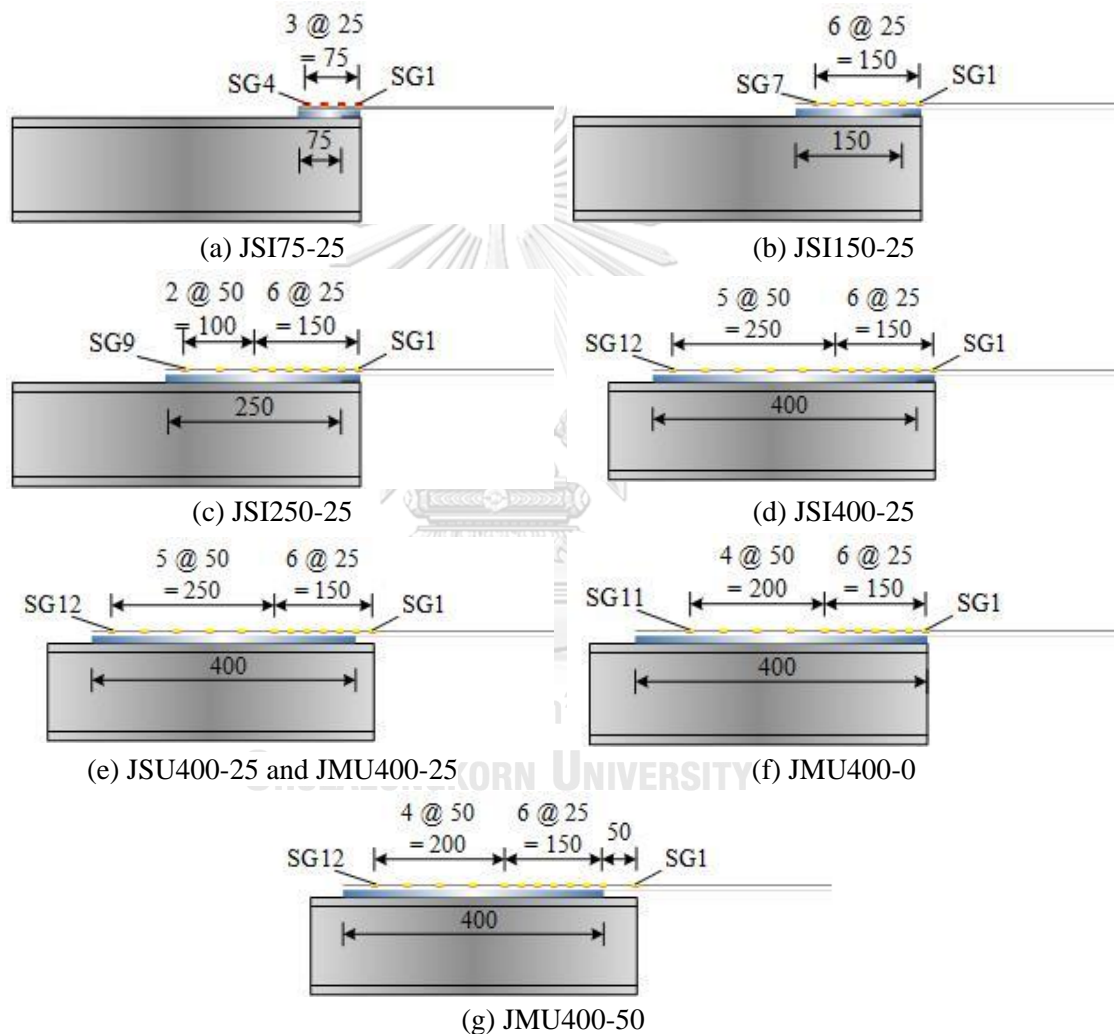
Instrumentation on joint specimens (all dimensions in mm).
